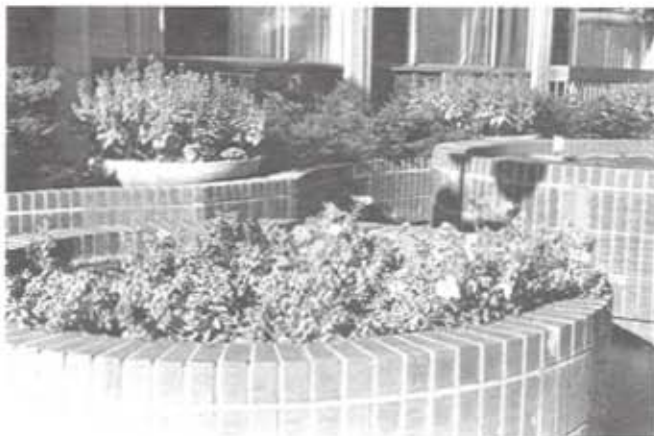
A good example of circular brick planters that complement the curvilinear design of the brick wall in the background. Planters as high as this must have weepholes at their base for adequate drainage.
